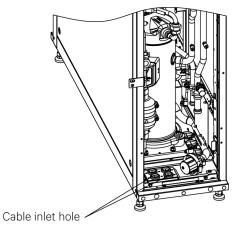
Cable Access on the Top Plate and Bottom Plate
